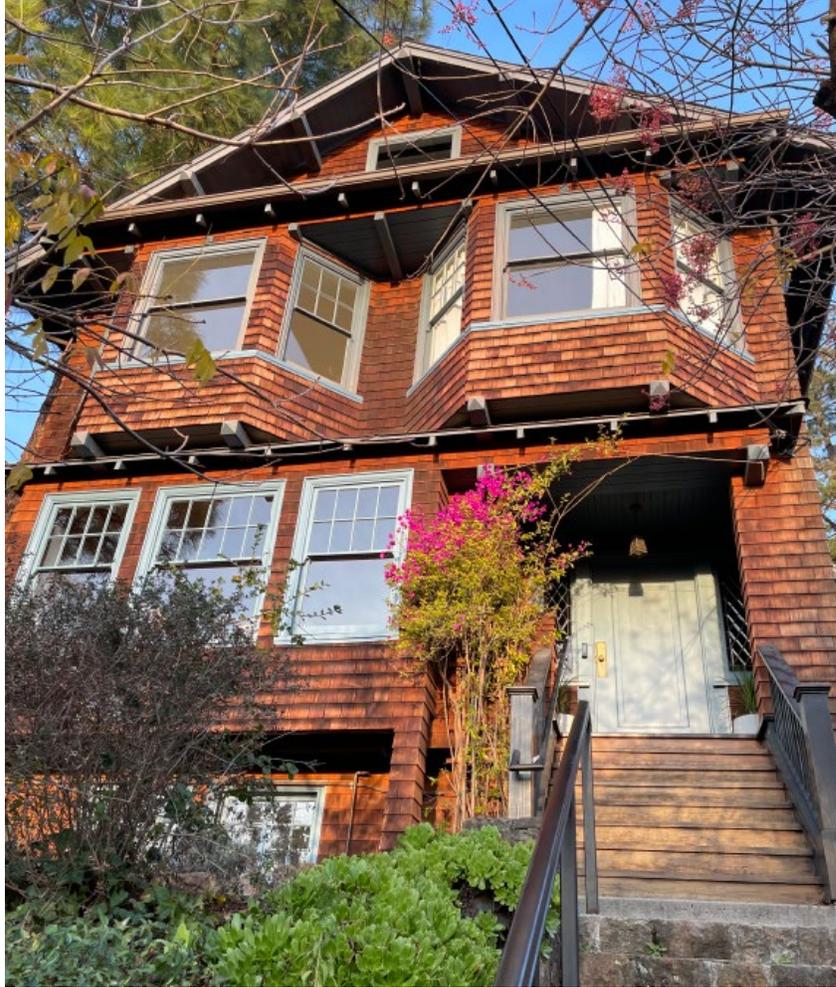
Existing Site Conditions – North Elevation in 2022 (Jordan Kanarek)
